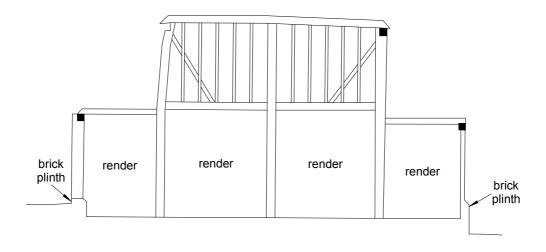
Internal elevation of north wall of structure 4 (17th-century aisled barn).
